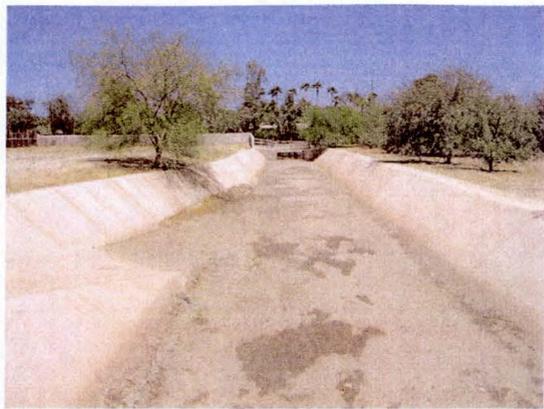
71st Street Channel between Paradise Dr & Cactus Road (facing north)
